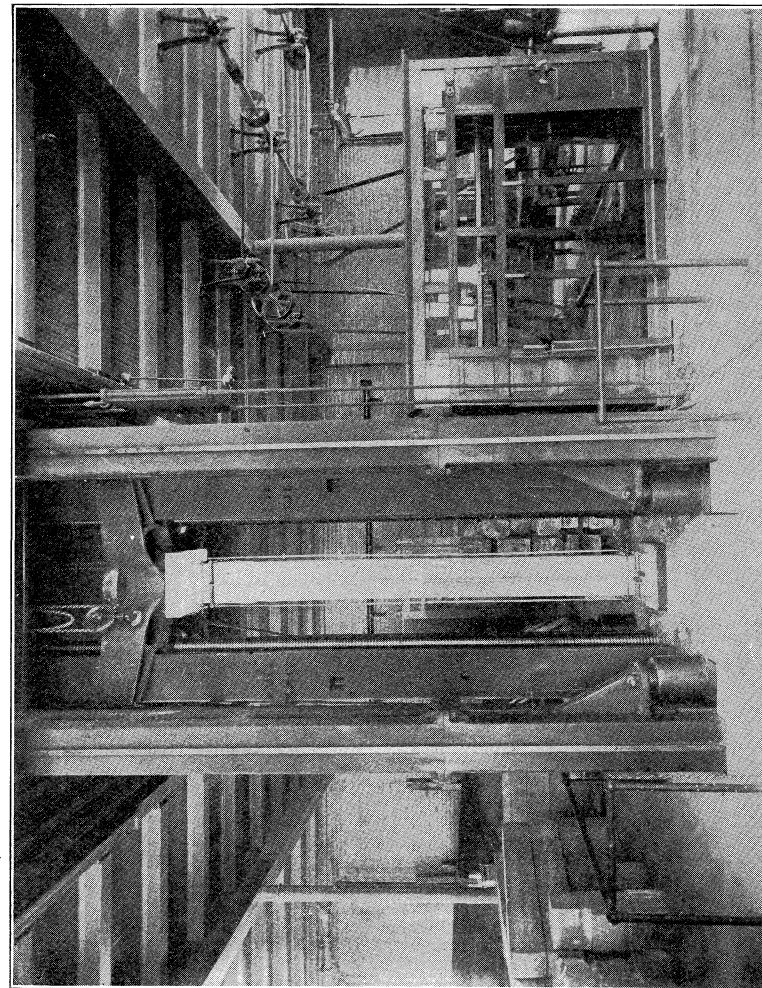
TESTING 12 X 12 IN. CONCRETE COLUMN IN 600,000 LB. TESTING MACHINE
